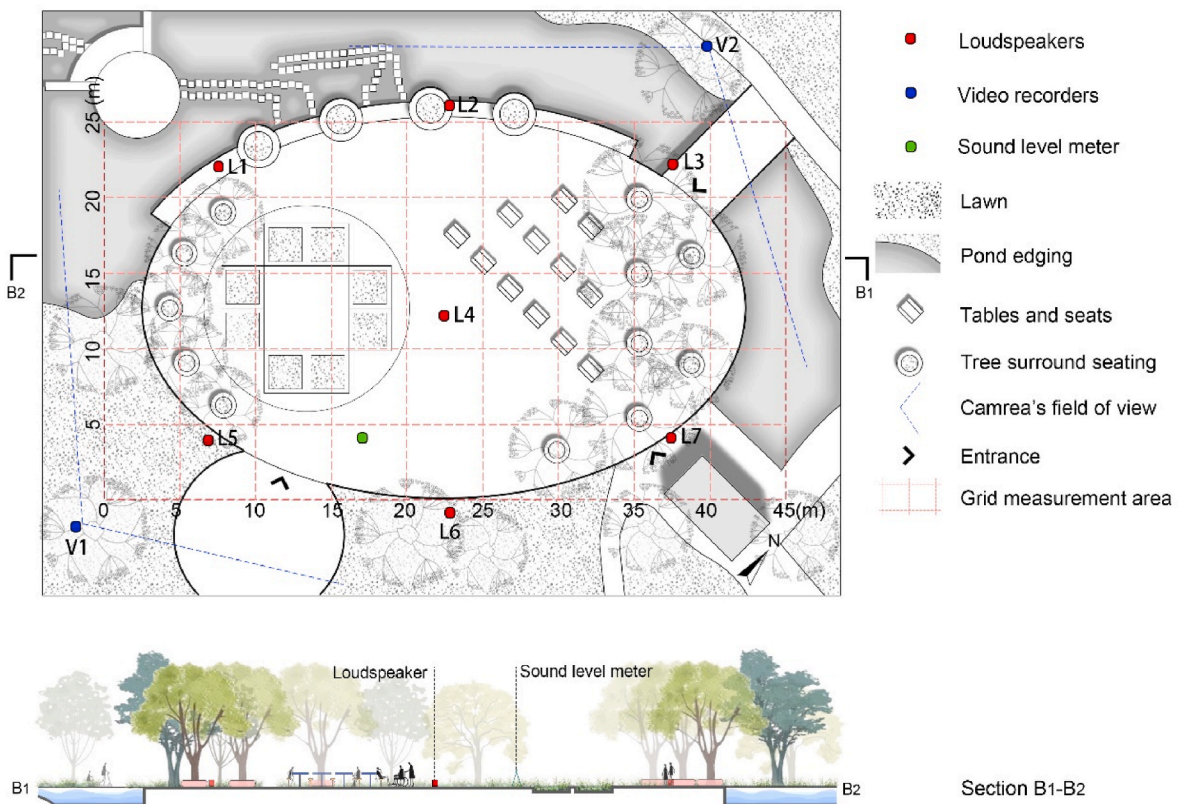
Layout plan and a section for experimental equipment in community activity space, Site B.
